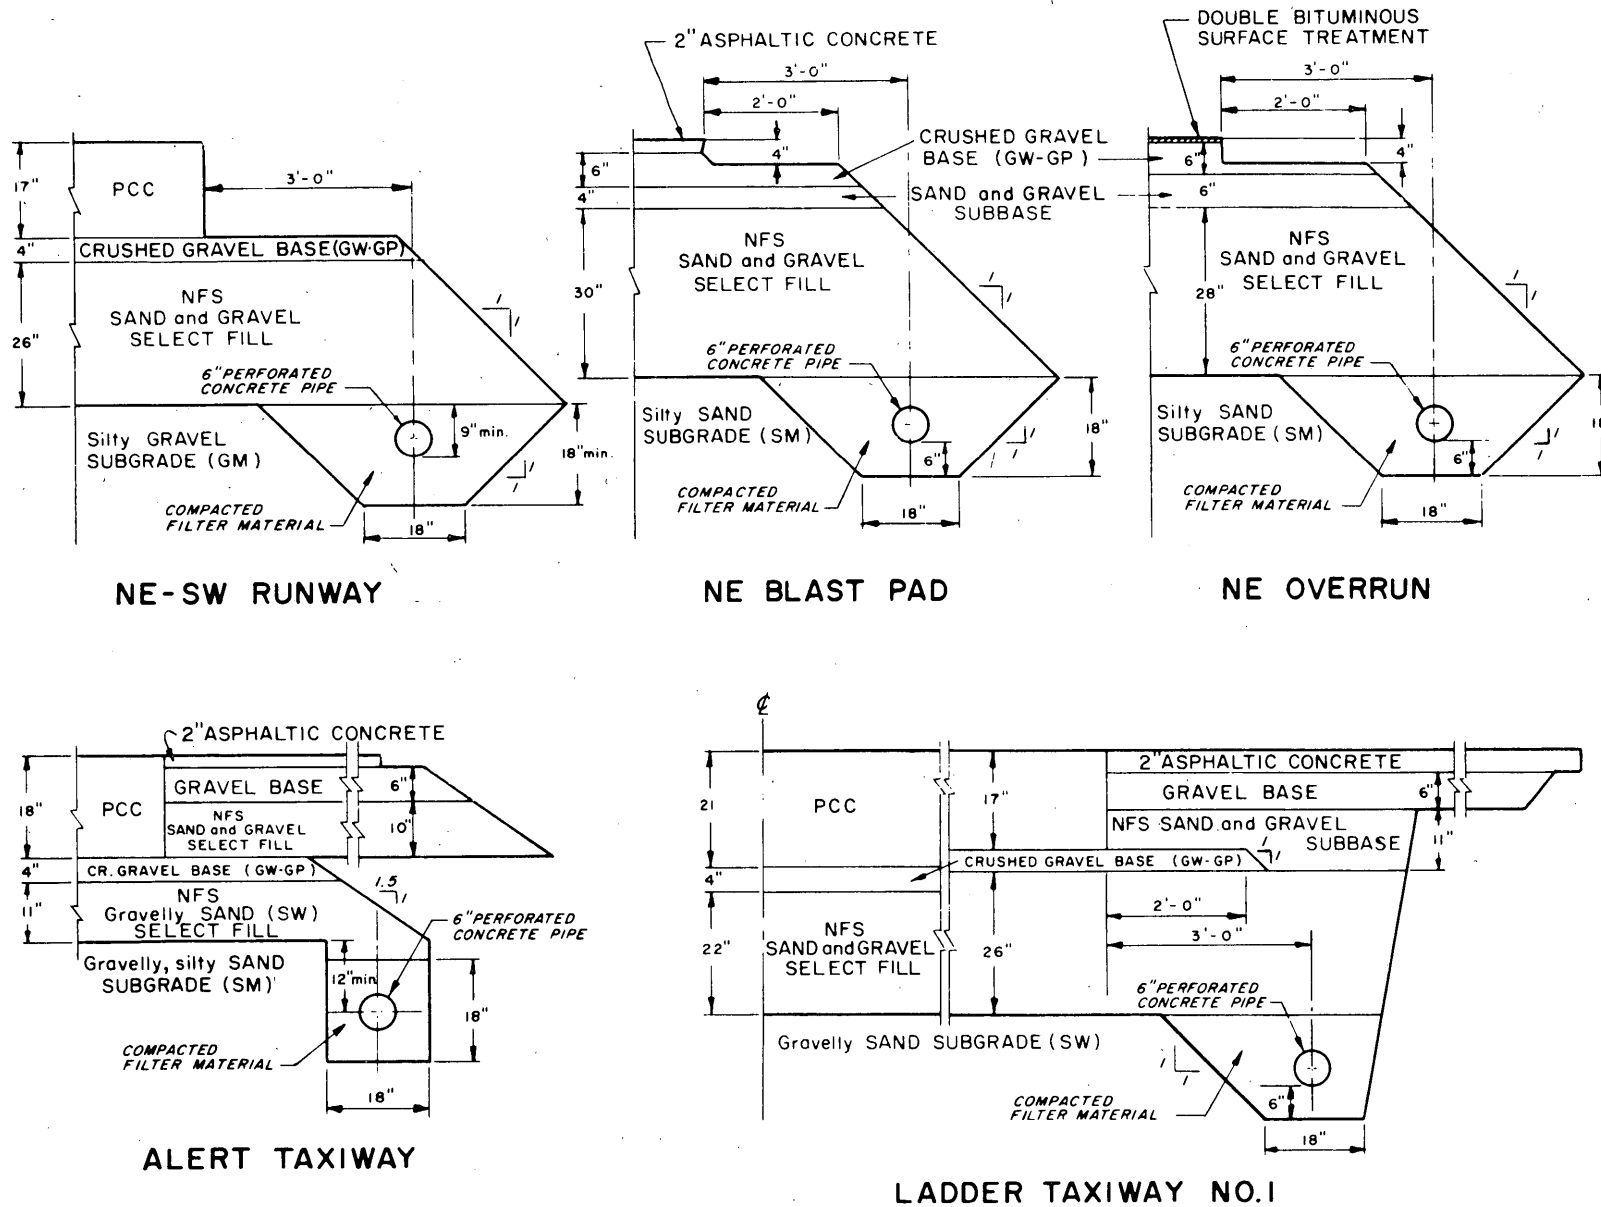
Typical pavement and subsurface drainage sections, Fairchild AFB.
